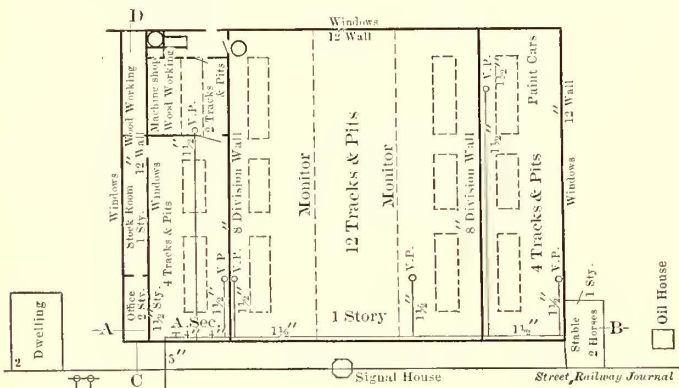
PLAN OF POORLY DESIGNED CAR HOUSE
